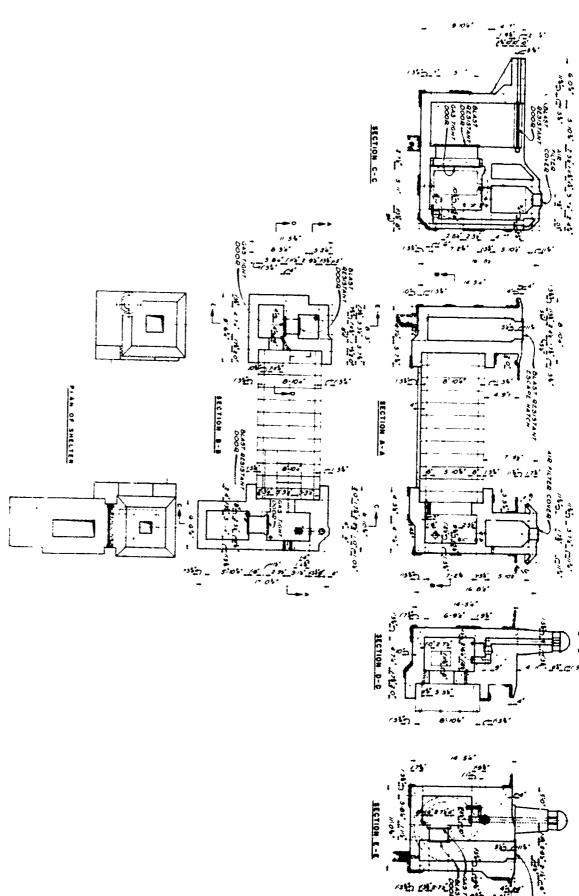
Circular shelter, type 50, structure II-2, architectural layout.
